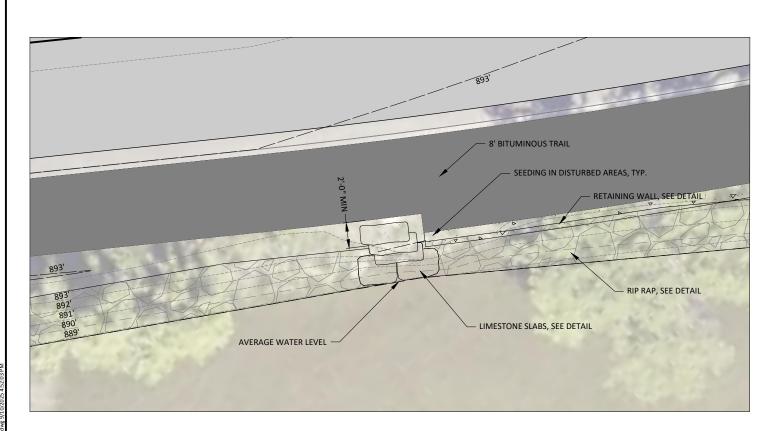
DETAIL PLAN: OVERLOOK 1 (APPROX. STA. 30+85)
